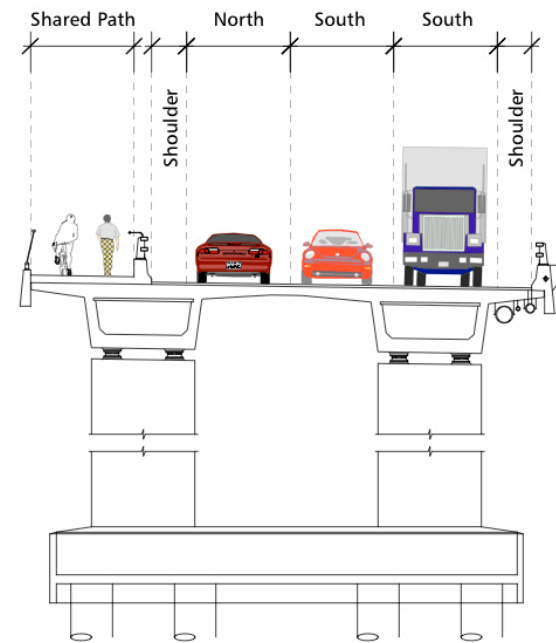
Typical cross section of the replacement bridge (future three lane configuration).
